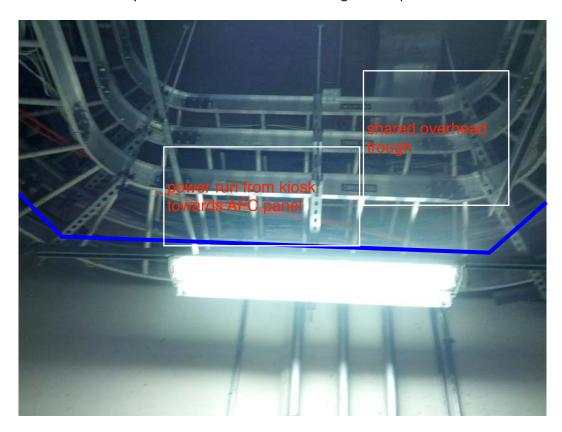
Navy Yard West: Wire transition from shared overhead trough to 2" conduit to AFC panel
